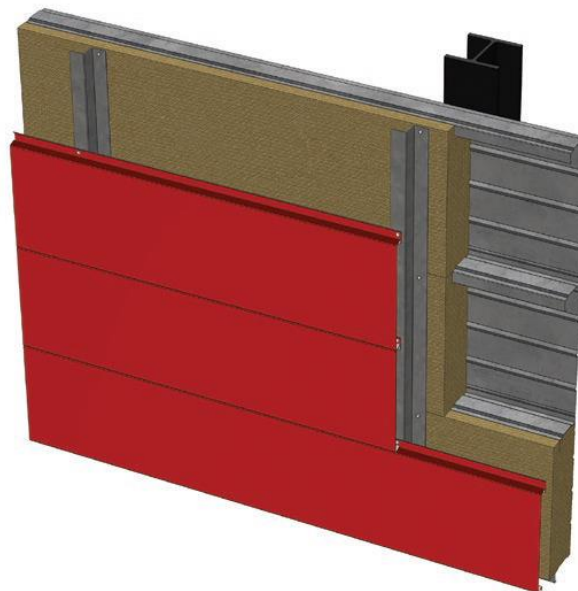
Two layer build-up wall cladding system with outward panels instead of trapezoidal sheets [product catalog of Bacacier]
